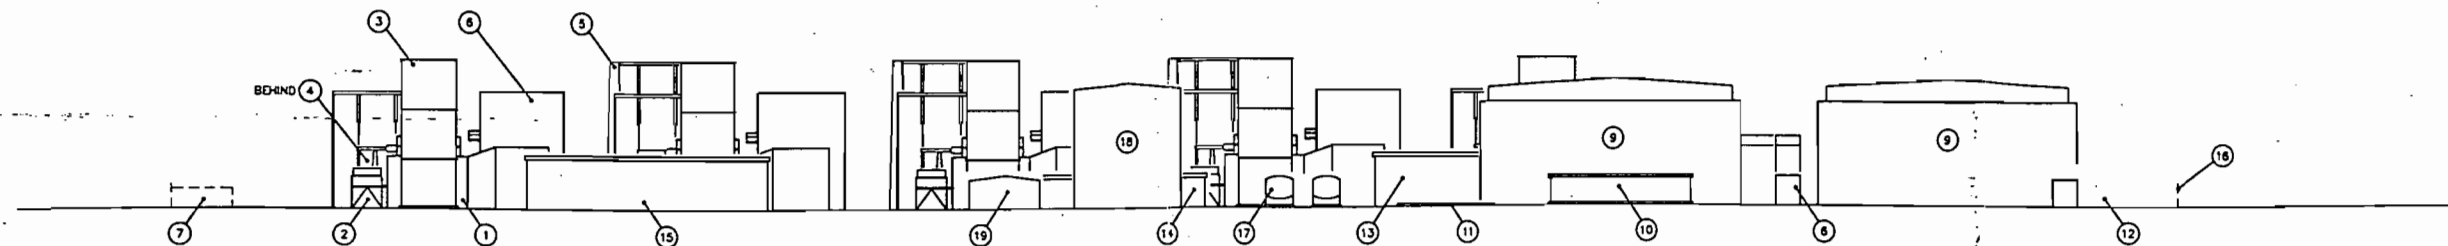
SITE ELEVATION LOOKING EAST FOR THE PROPOSED OLEANDER POWER PLANT
